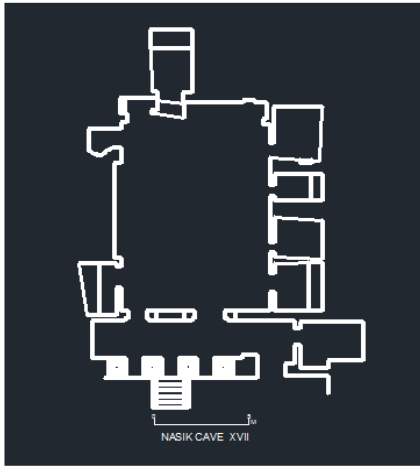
Plan of Cave No. 17 (Author, n.d.)
